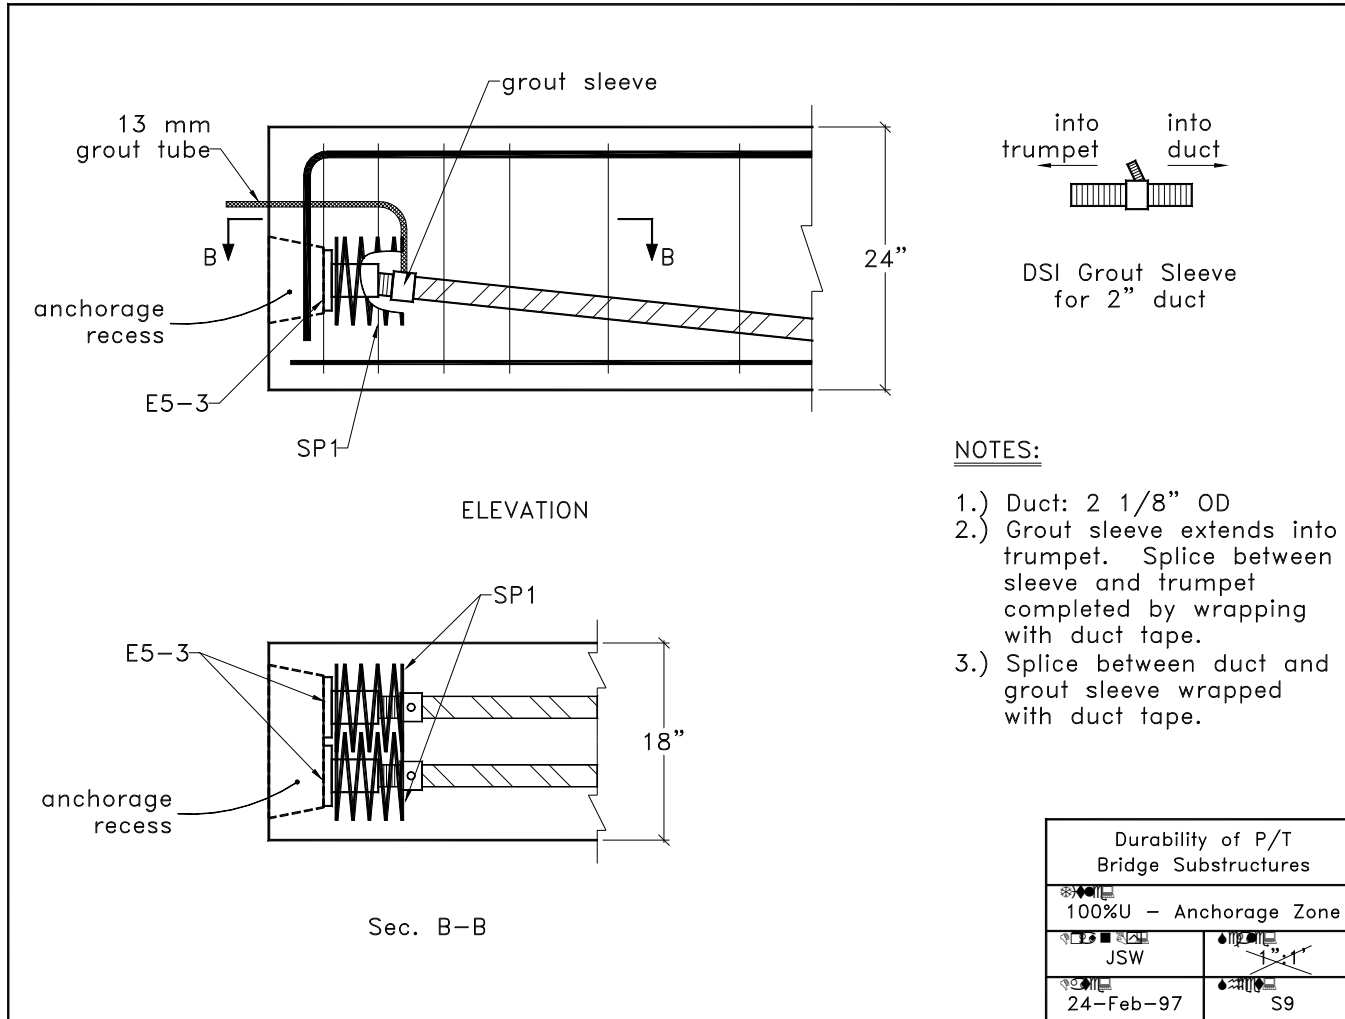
Sheet S9: 100%U Anchorage Zone
